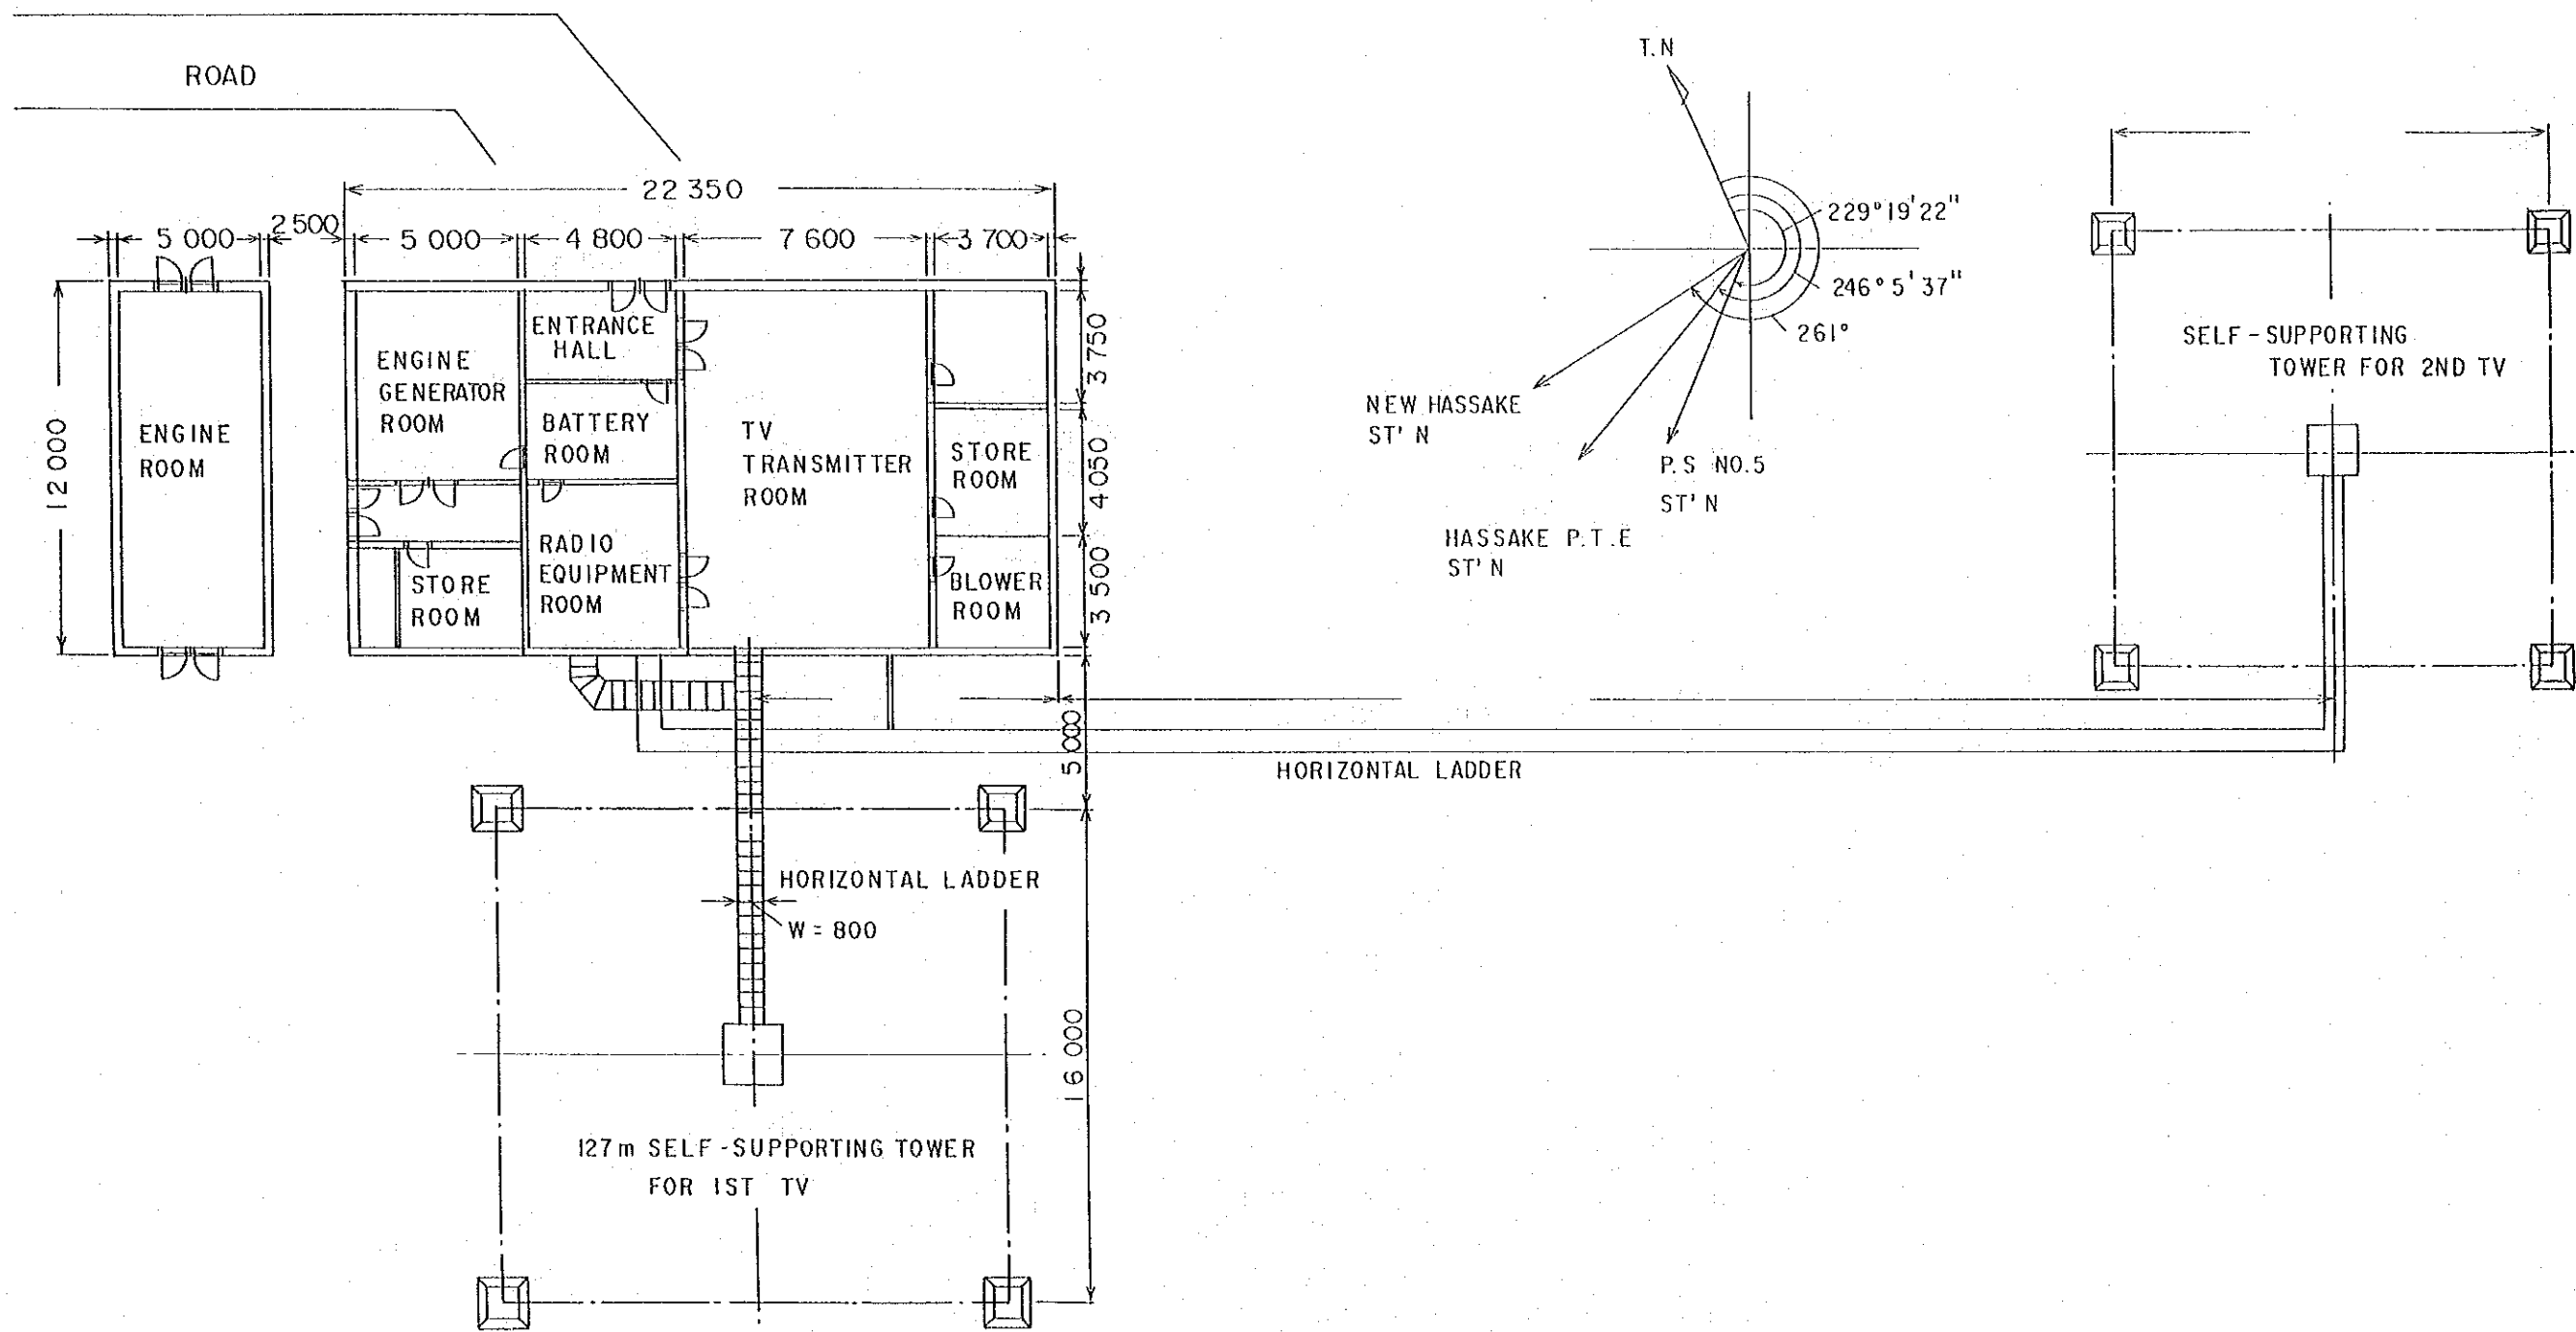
SITE LAYOUT FOR EXISTING HASSAKE STATION
